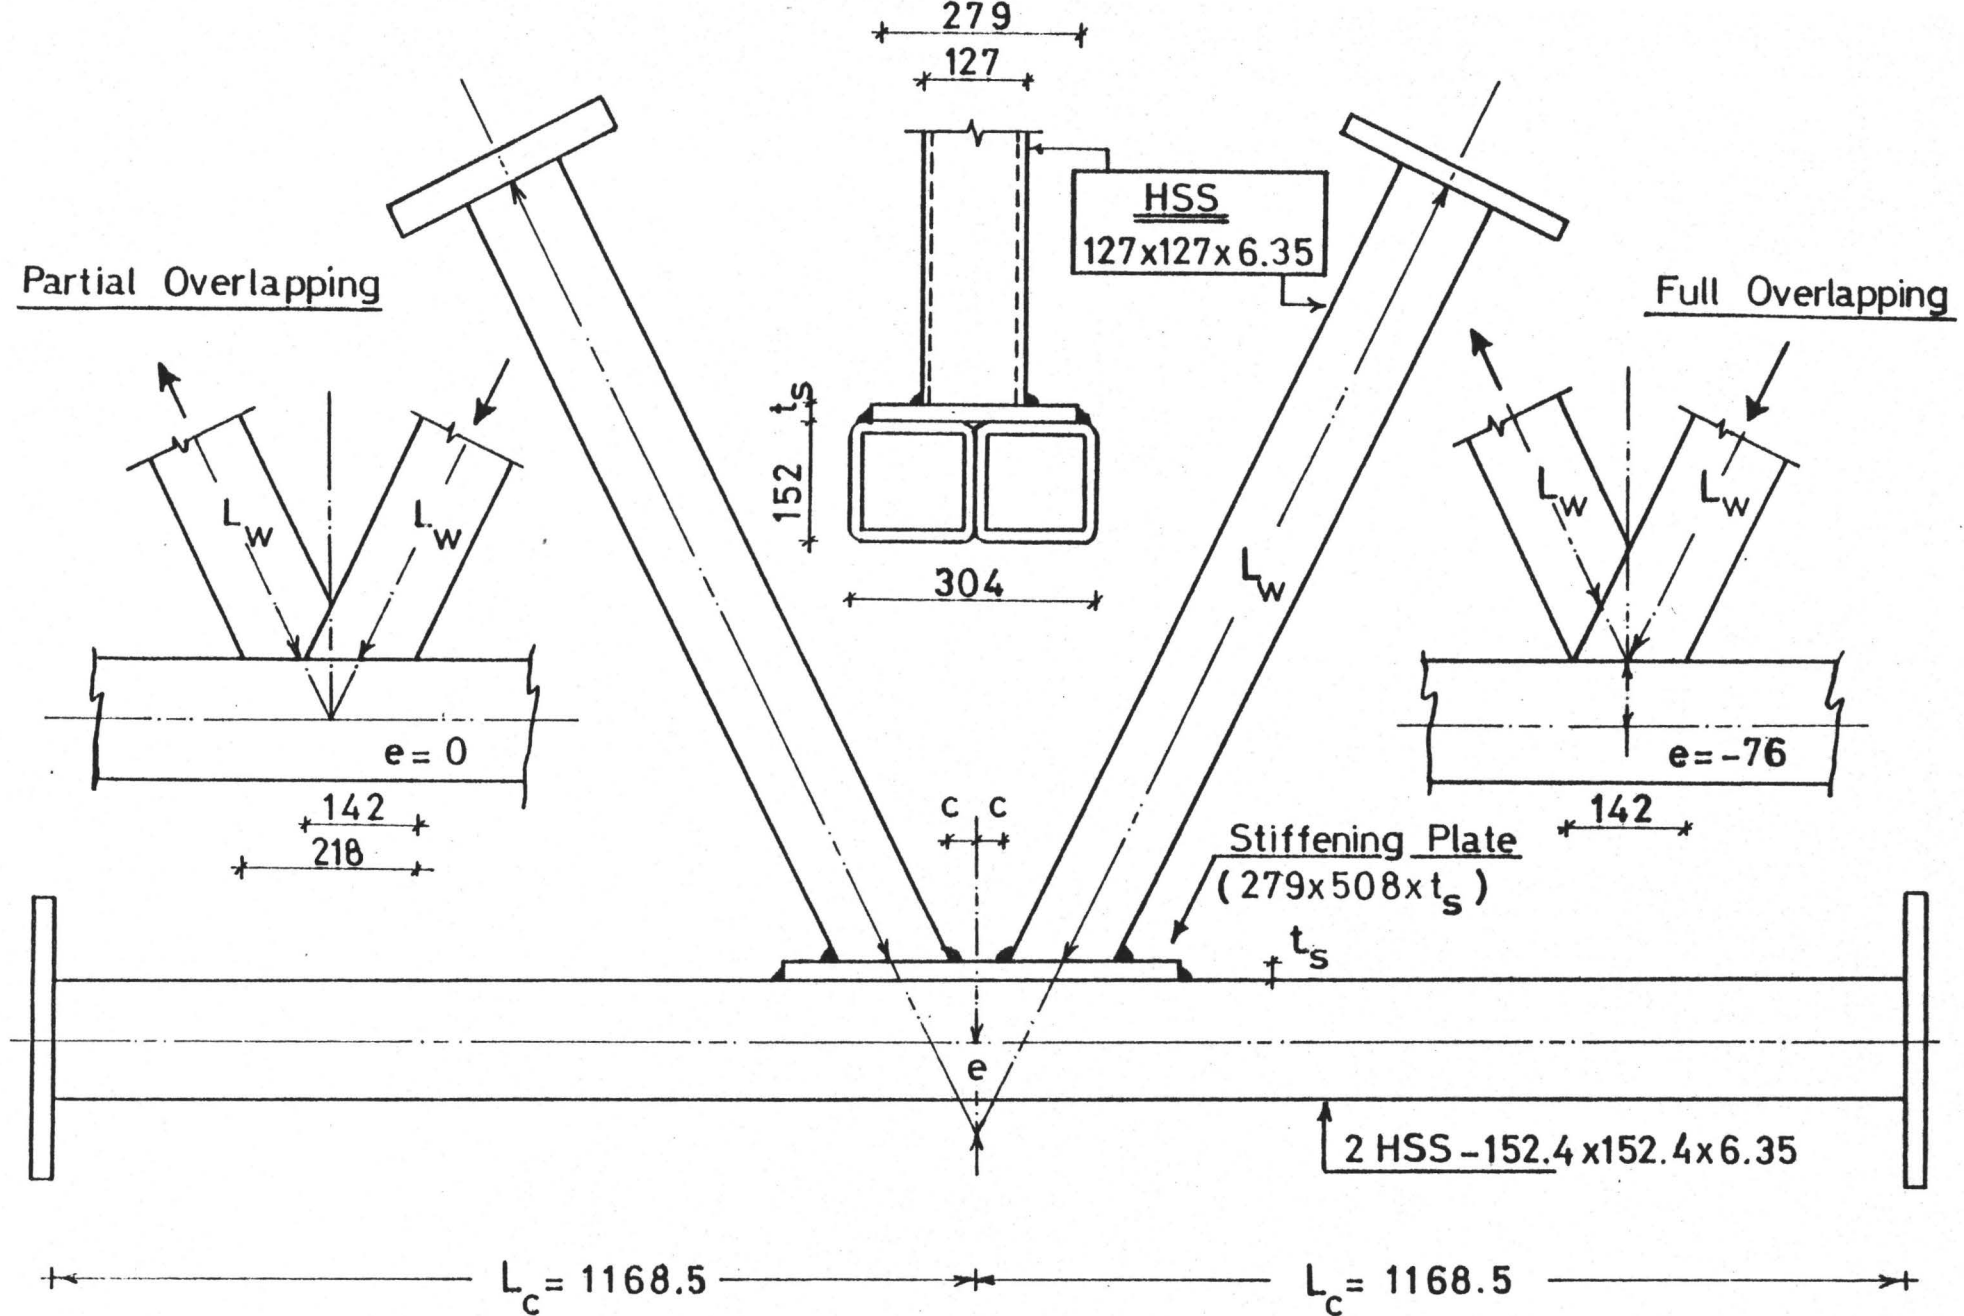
BACK-TO-BACK CONNECTION (Dimension in mm)
